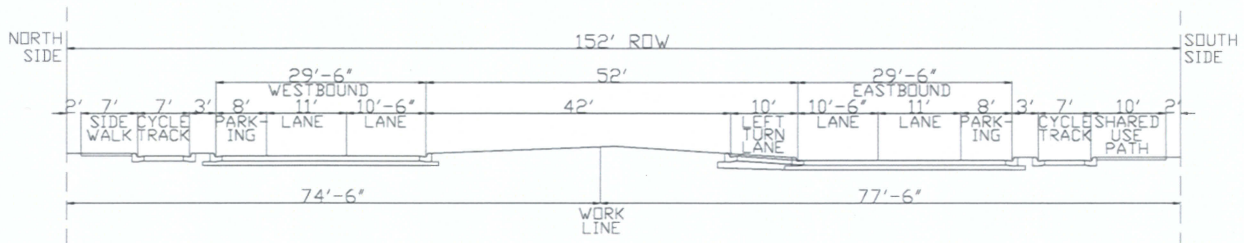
Proposed Roadway Typical Section – Century Boulevard to Milestone Center Drive
